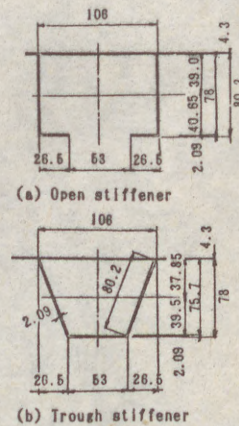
Cross-Sections of Stiffeners (dimensions in mm)
